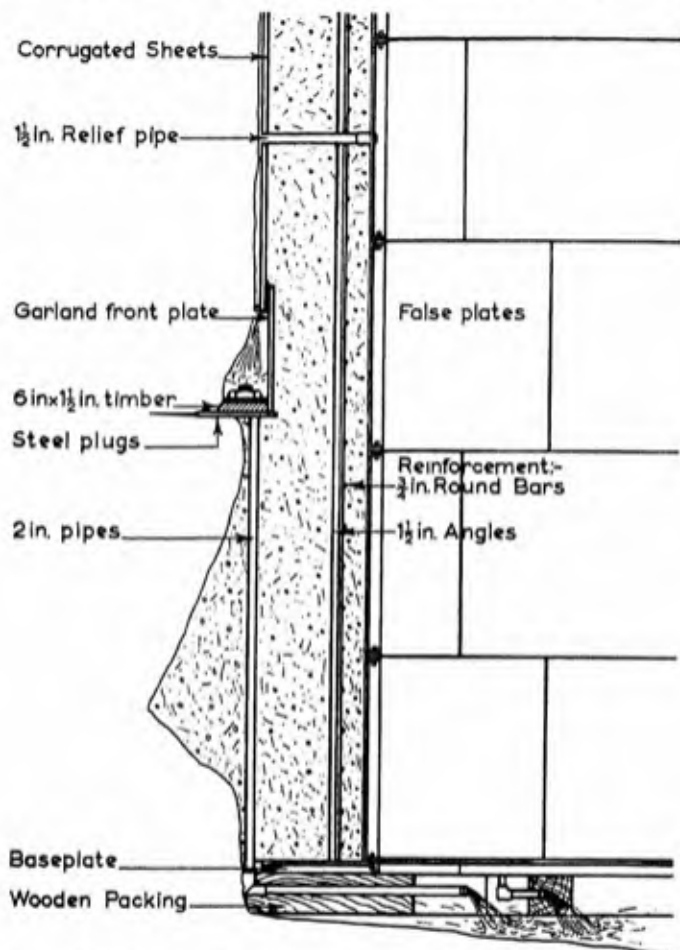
BACK SHEETING, TEMPORARY GARLAND AND REINFORCED WALL
